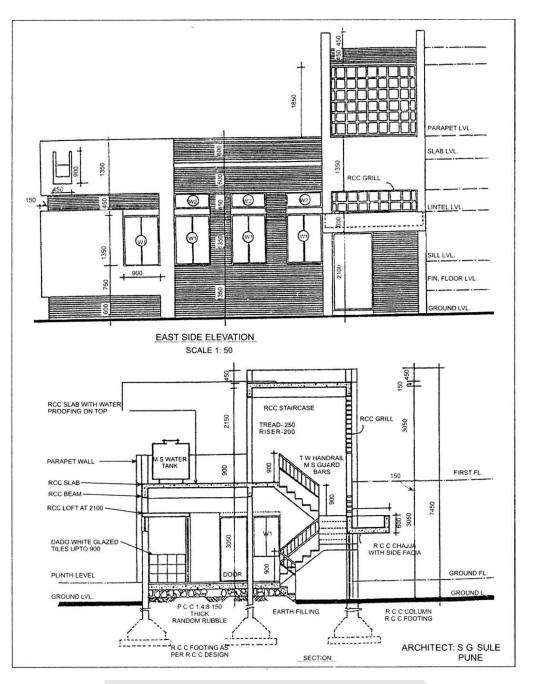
RCC Framed Structure – Elevation and Sectional View
